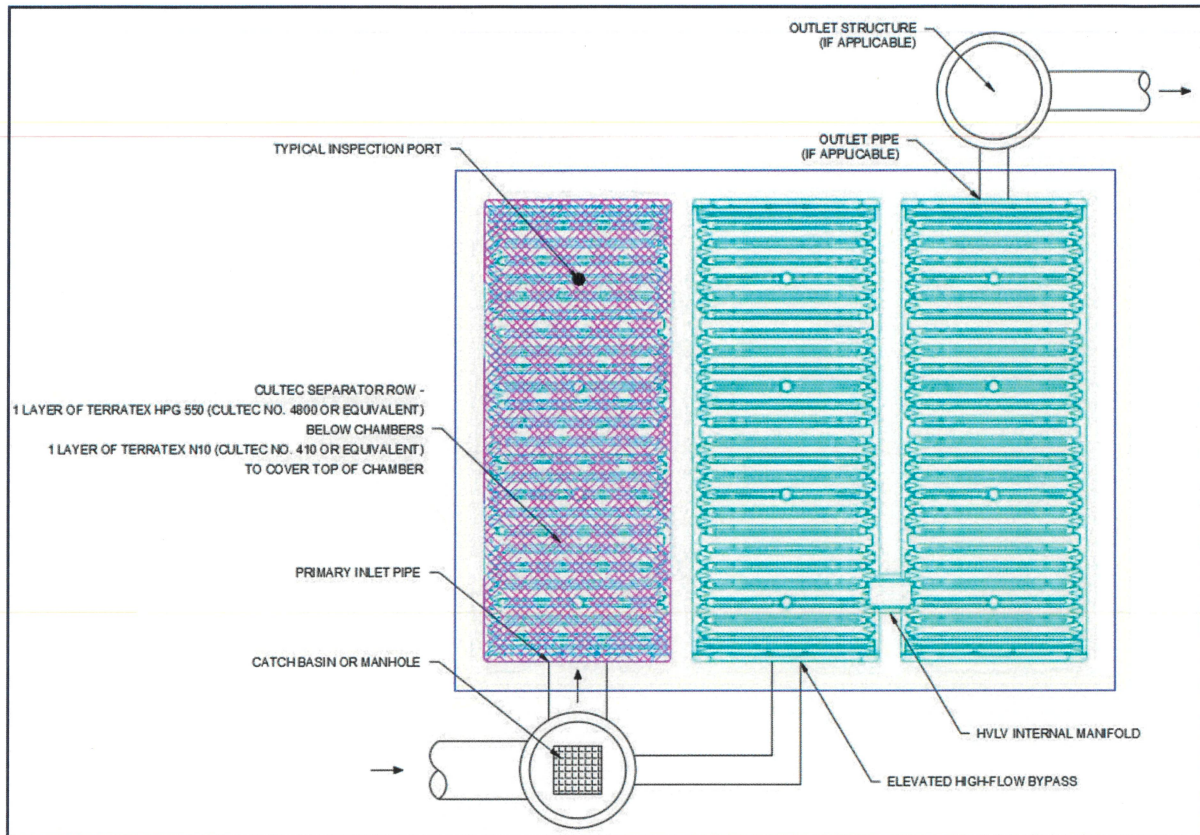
Cultec Separator Row™ Filtration System – Plan View
